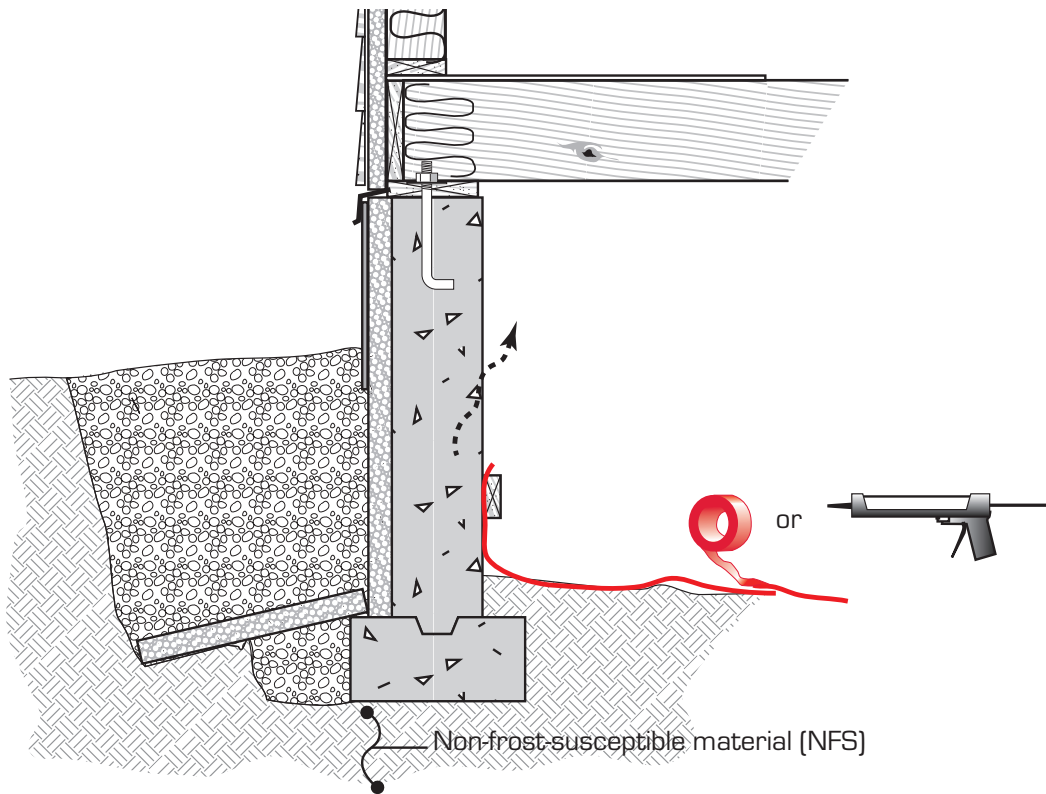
If the foundation is insulated on the outside, the basement wall should be allowed to breathe on the inside.
